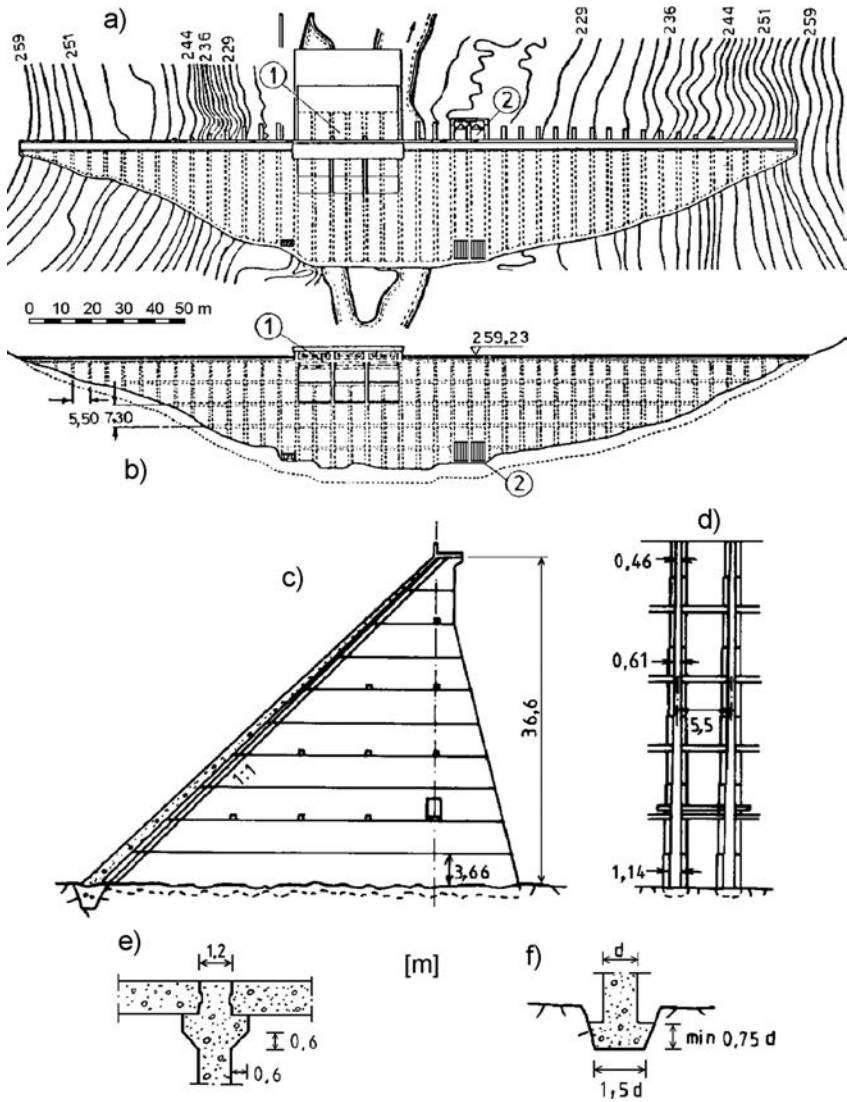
Stoney Gorge dam (after Golzé, 1977). (a) Layout; (b) longitudinal section; (c) cross-section; (d) elevation from the downstream face; (e) typical joint of a buttress with slabs; (f) foundation of buttress. (1) Controlled overflow; (2) bottom outlet.
